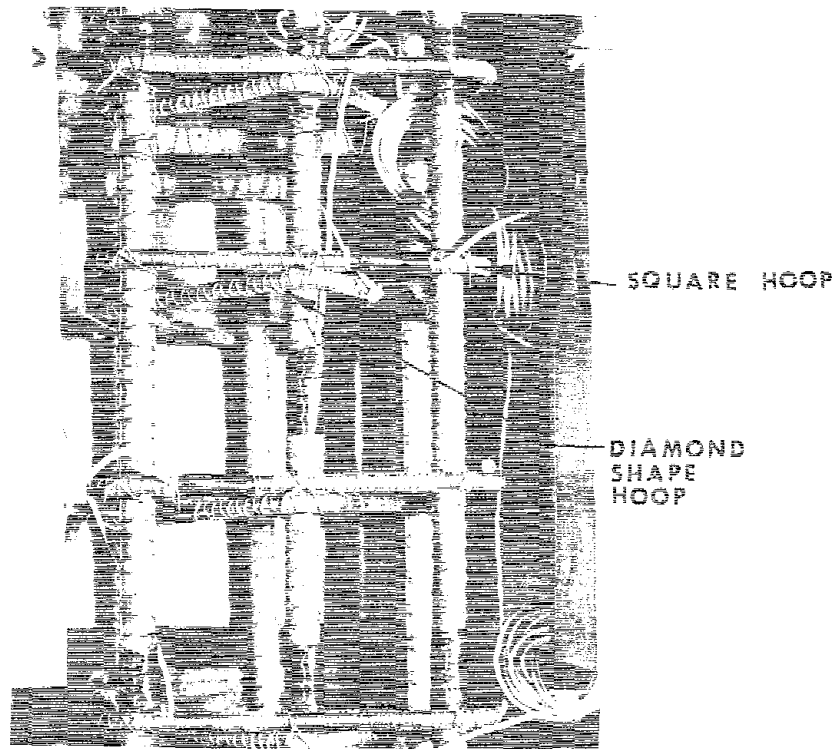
Joint Hoop Reinforcement and their Spacing
